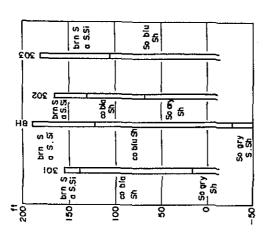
Drill Holes at Powerhouse and Intake Site (3)
